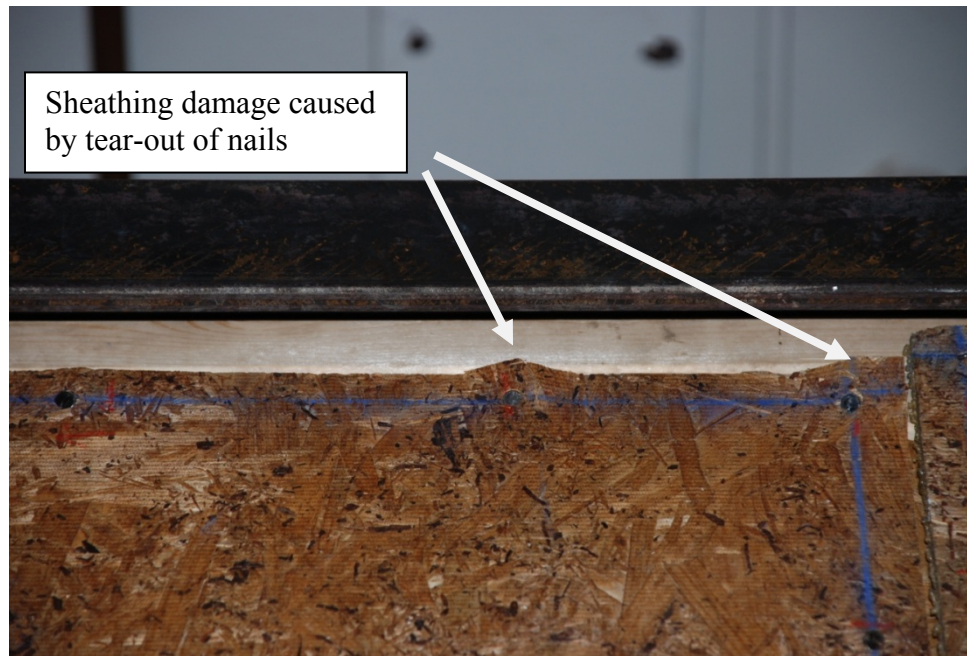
Sheathing damage along top plate of Specimen A1-1M
